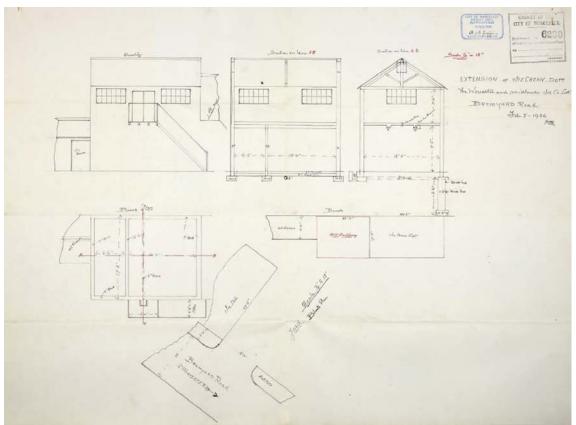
Building I 1934 planning application drawing (Building application number 6230)
